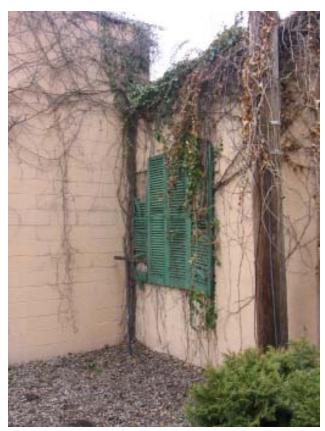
Garage- South elevation, south wall of addition and west wall of original building
